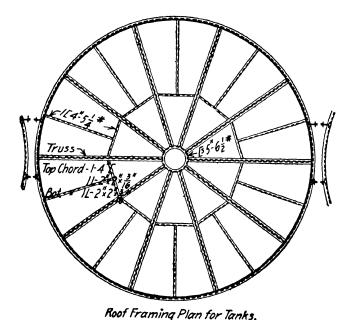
Framing for Roof of Circular Bins, Independent Elevator.
